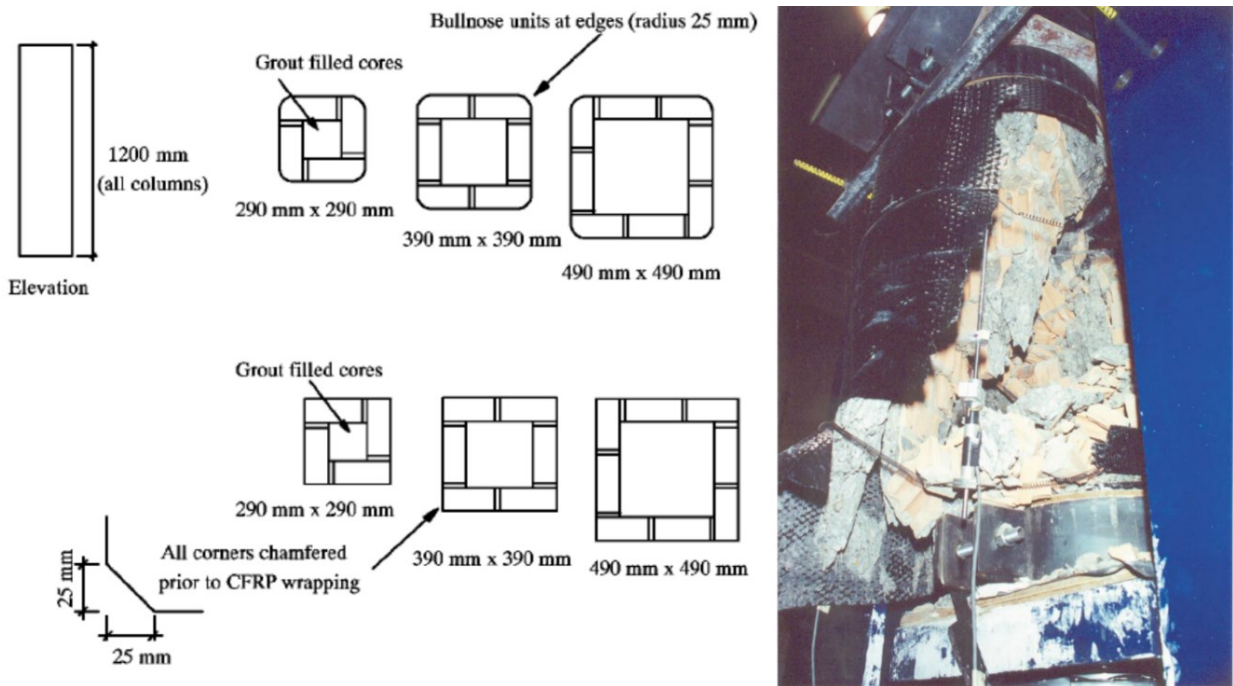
Masonry columns details and circular section column failure (Masia and Shrive, 2003).
